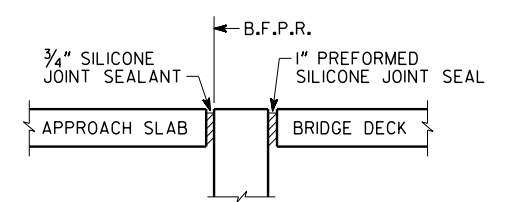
" EXPANSION JOINT IN BARRIER
